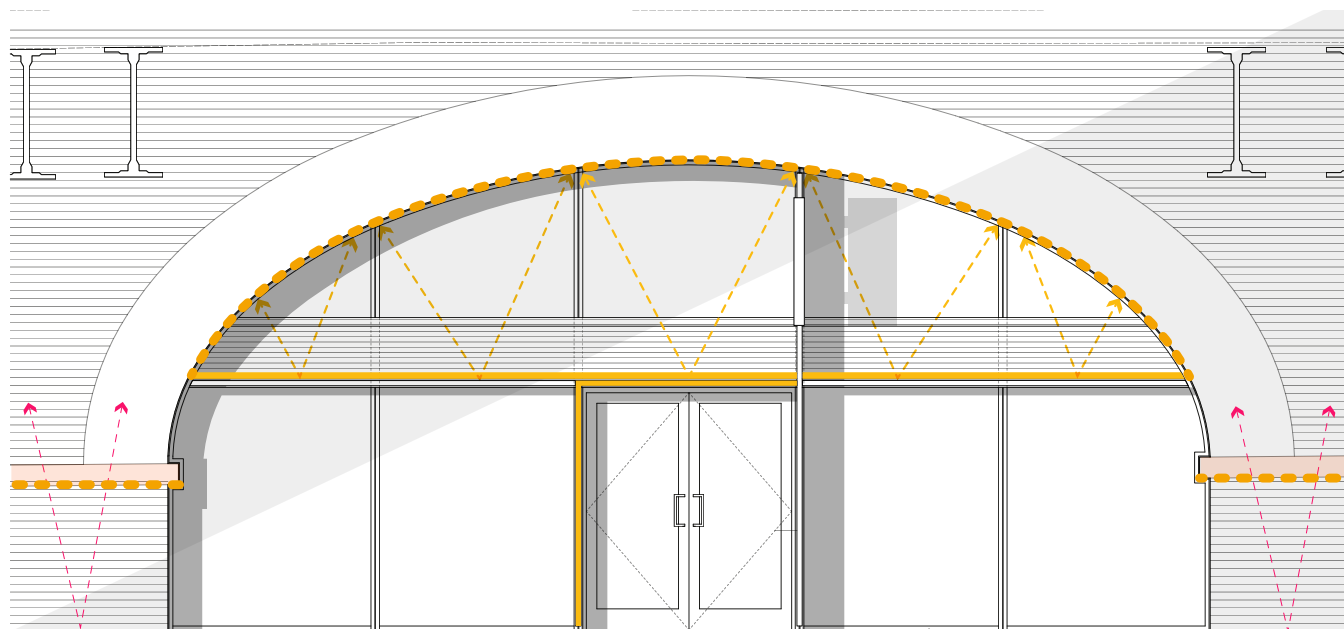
Elevation: Designated lighting zone for a typical A1 shopfront
